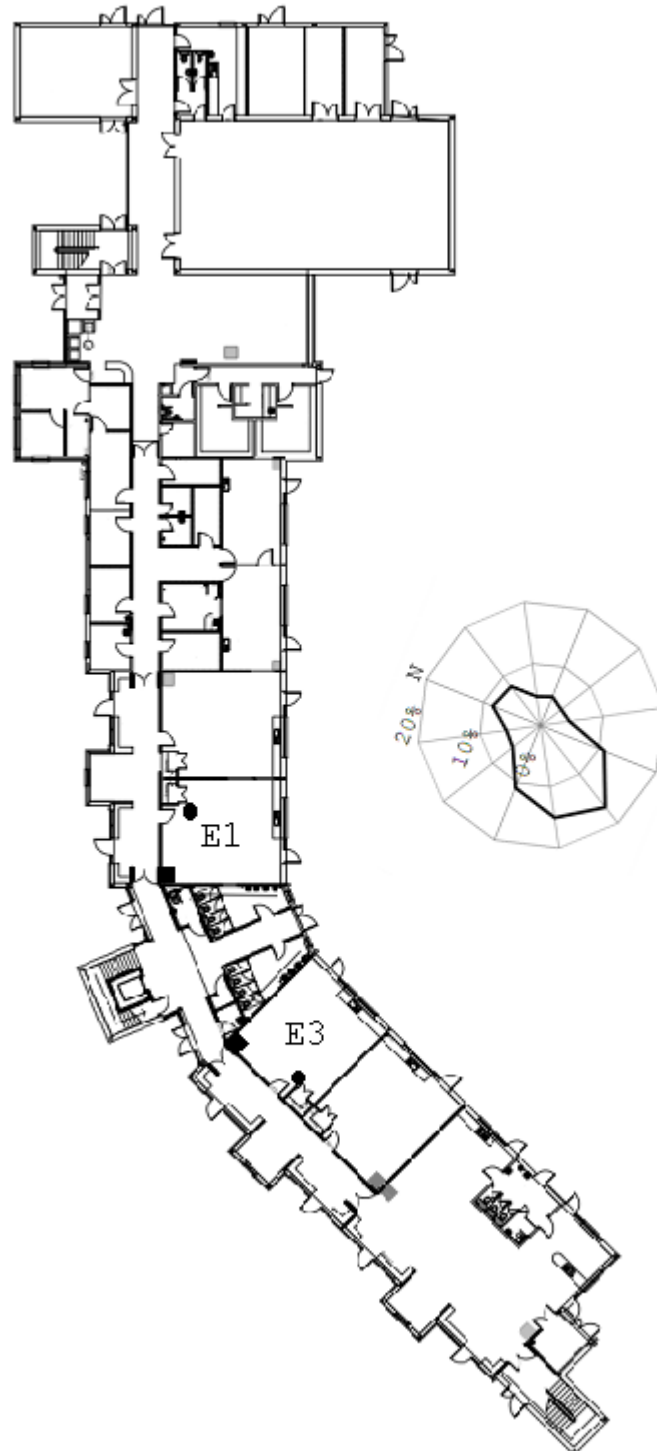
School E, plan view, ground floor. E1 and E3, floor area 57.40 m².
